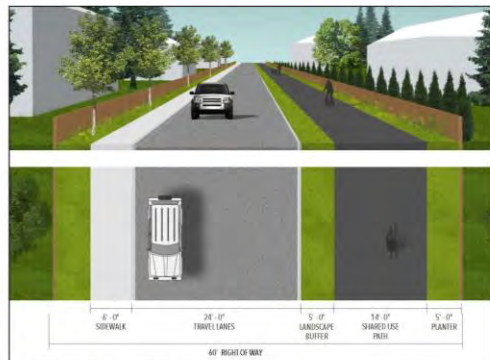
Buxton Road to NE Sandy Avenue route and sections.
